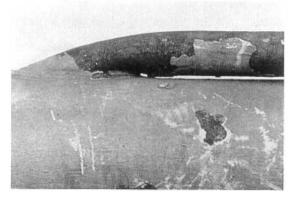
Web member at the bottom of Fig. 5 indicating that the weld has not parted in spite of the large bending force.
